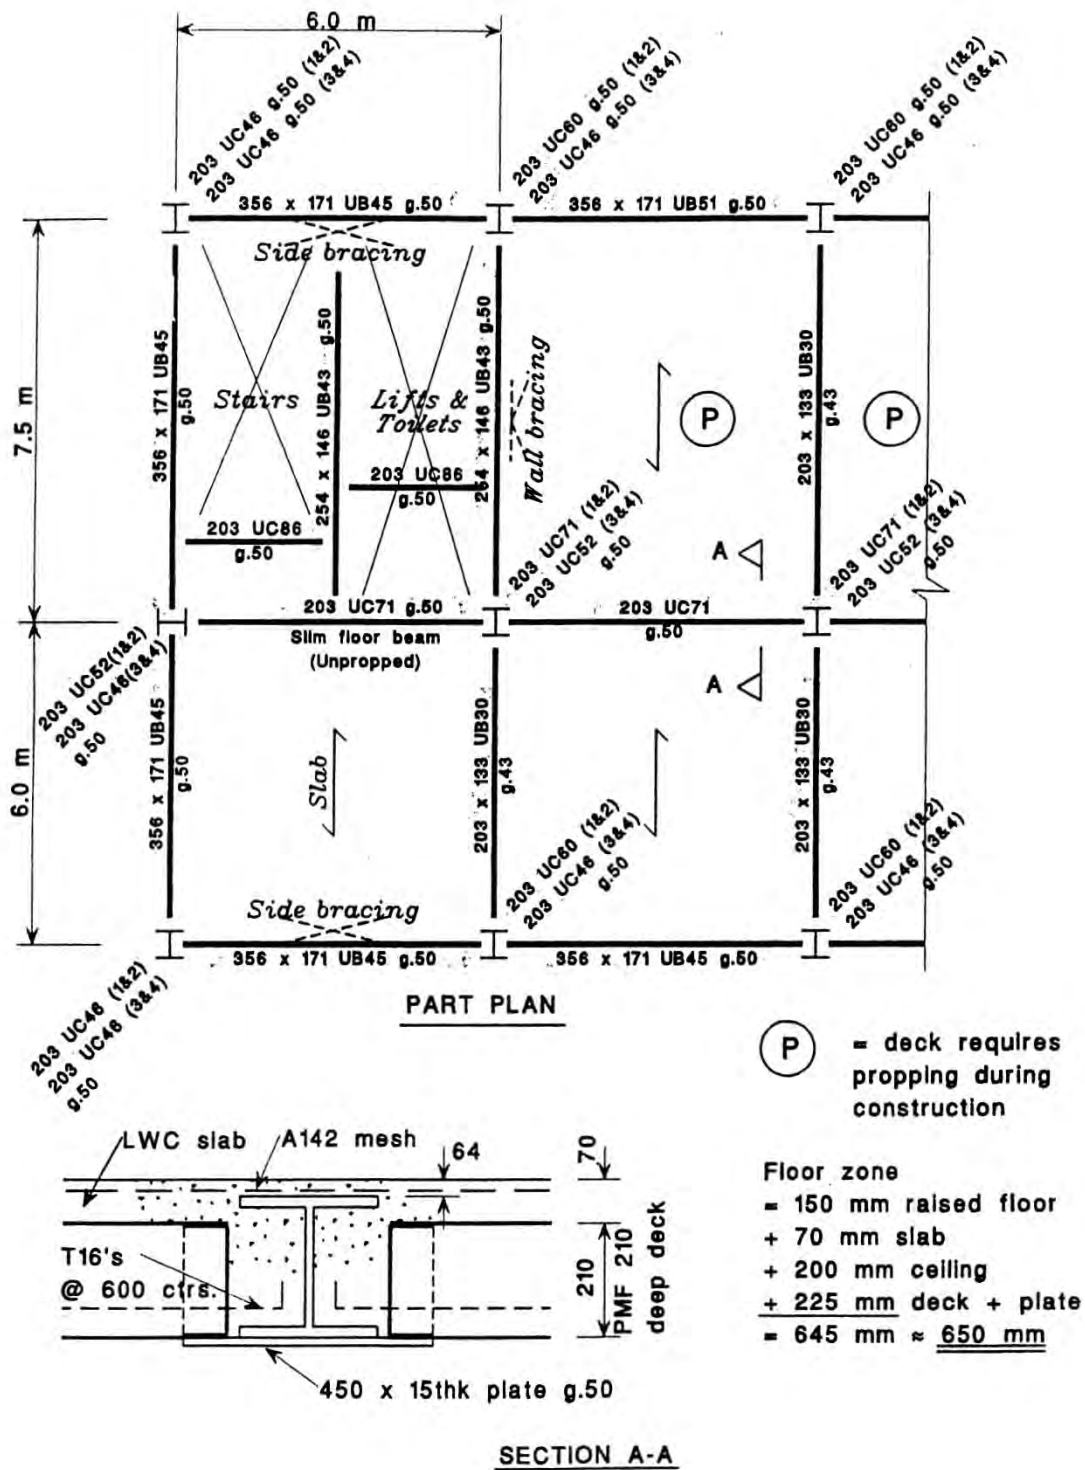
Slimflor[®] beams and deep deck floor (propped) (SCI 2004)
